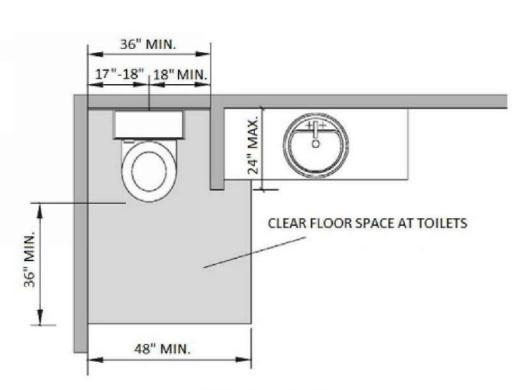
A-9M WING WALL OR CABINET AT WATER CLOSET
